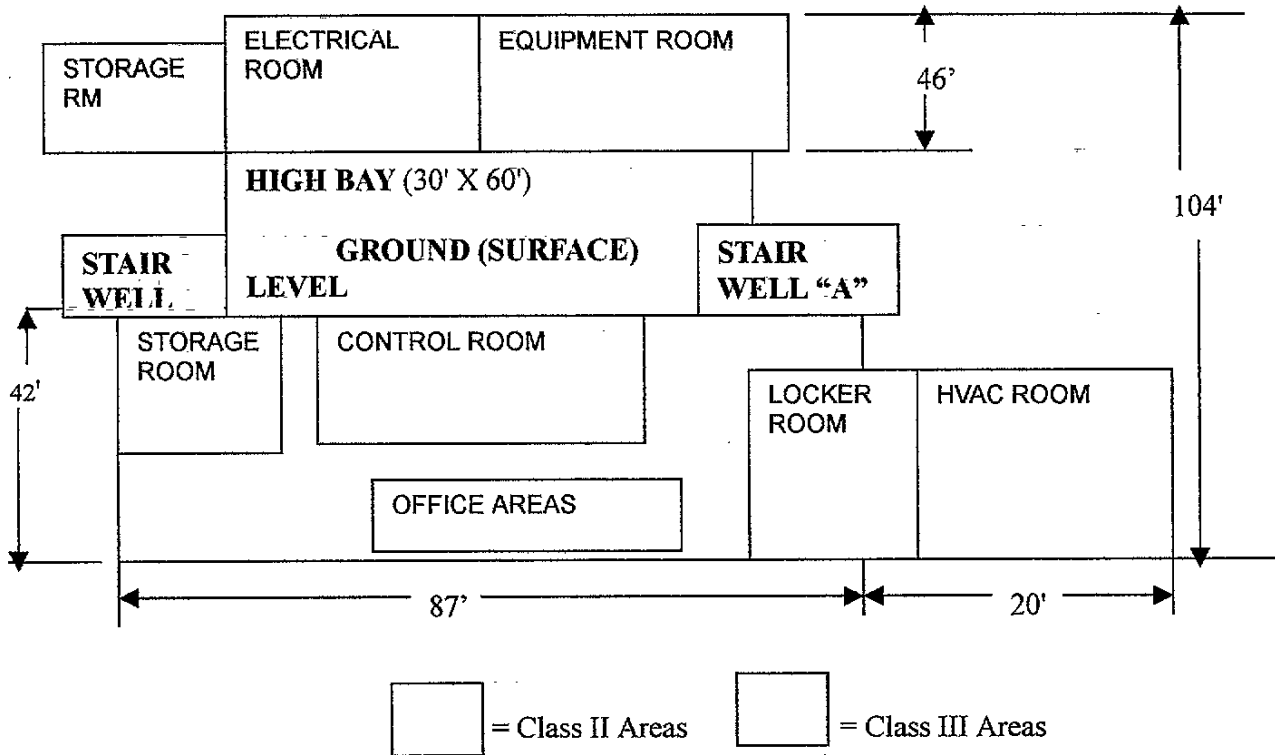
CLASS II AND III FLOOR PLAN (GROUND FLOOR LEVEL)
